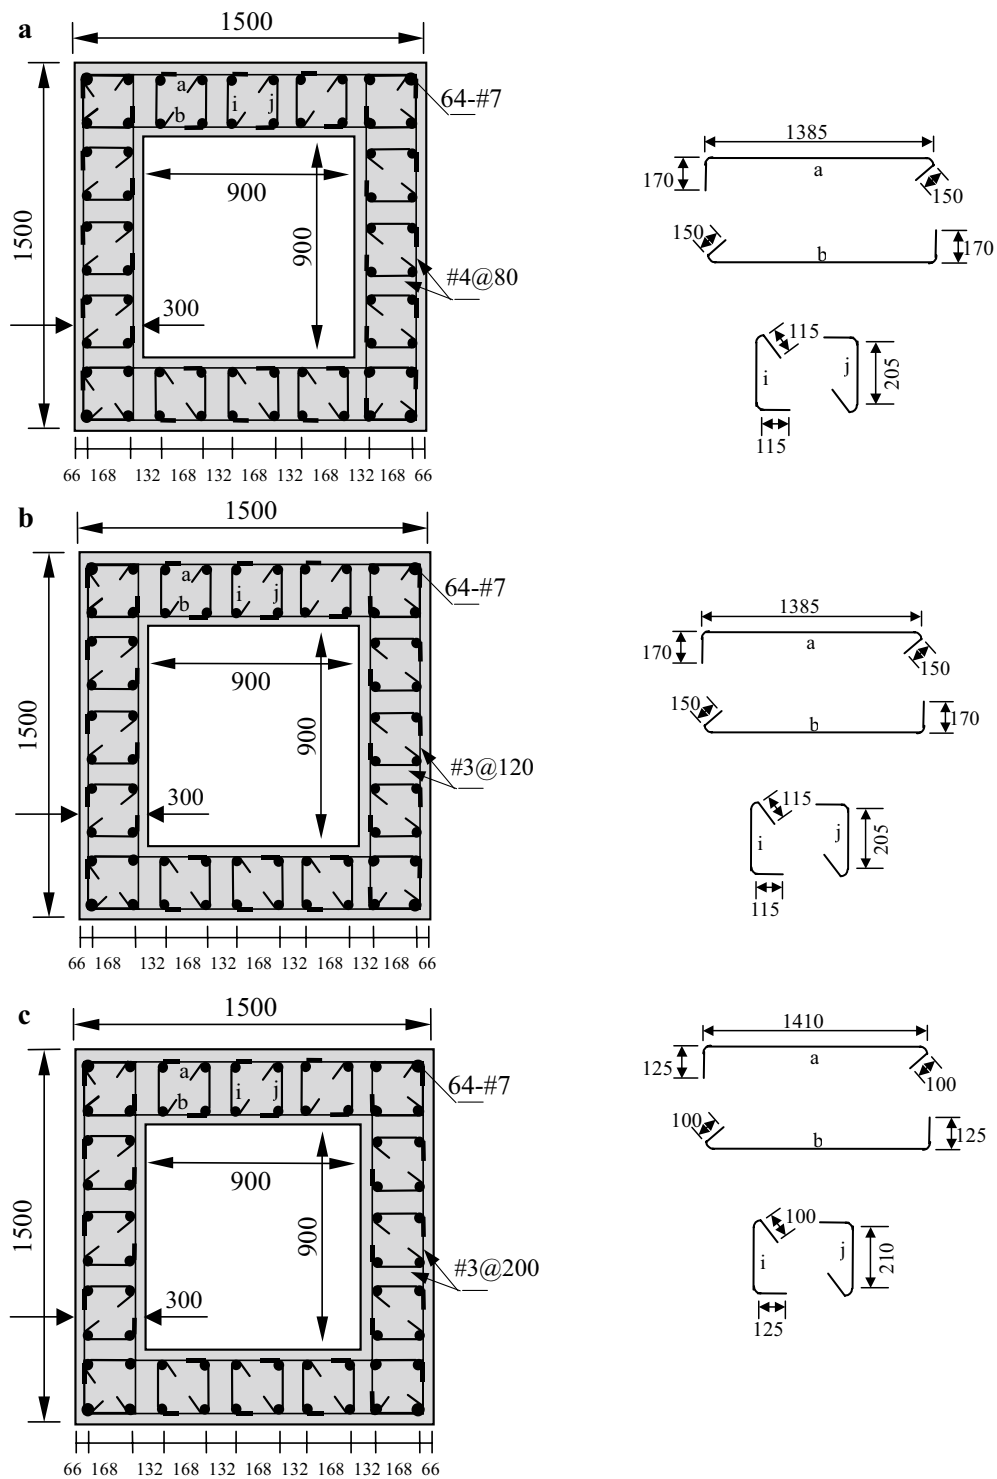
Dimensions of cross sections and reinforcement details of specimens a PS1, b PI1 and c PI2 (Dimensions are in mm) (Yeh and Mo 1999).
